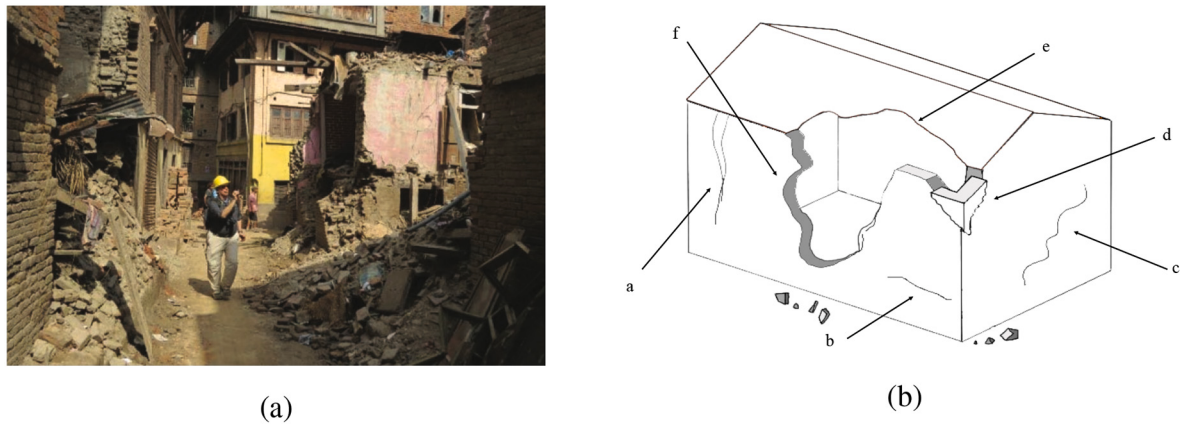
(a) Observation of unreinforced masonry building collapse [12] (b) Common failure mechanisms for masonry structures: a. vertical cracking; b. horizontal shear cracking; c. diagonal shear cracking; d. corner damages and wall separation; e. roof collapse; f. wall out-of-plane collapse.
